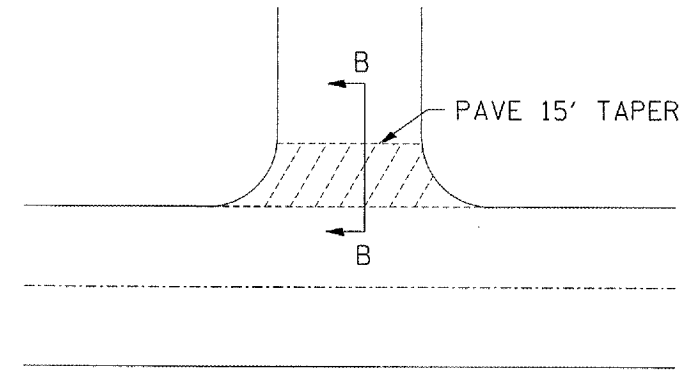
DETAIL OF HOT-MIX ASPHALT SIDE ROADS WITH BUTT JOINT
